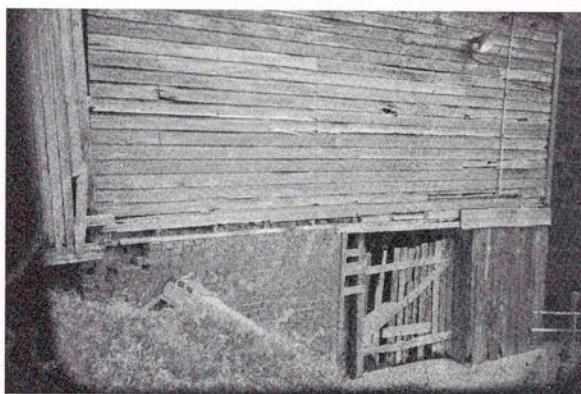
The south side of Jack Cooksey's barn with a brick foundation wall in the lower basement. (Photo by Lynda Ramsey)
